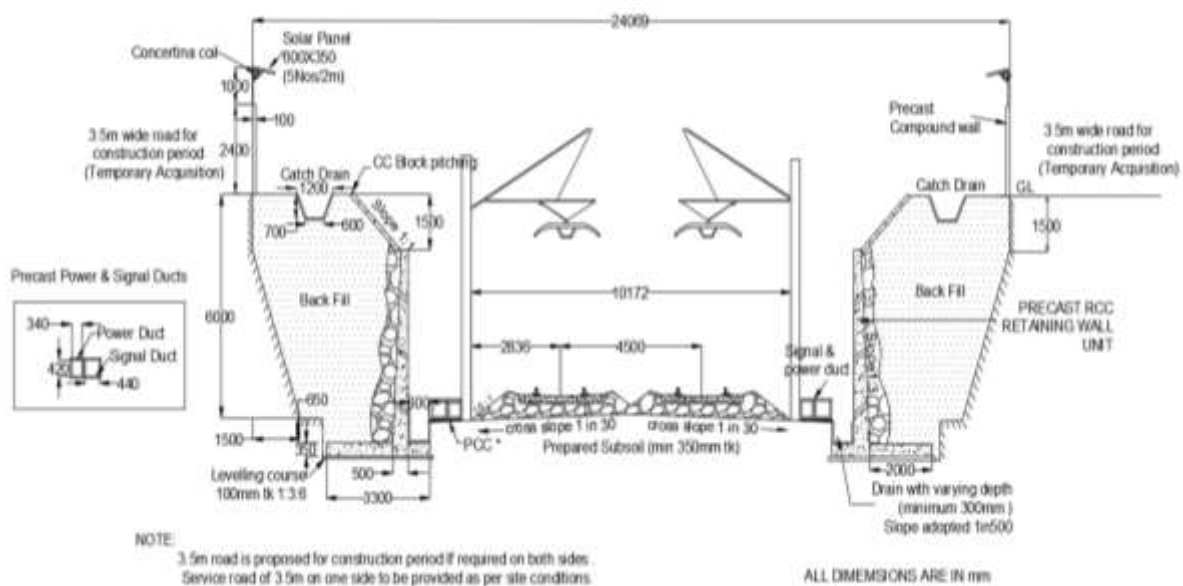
Typical arrangement of cut structure with RCC retaining wall (3m-6m)
